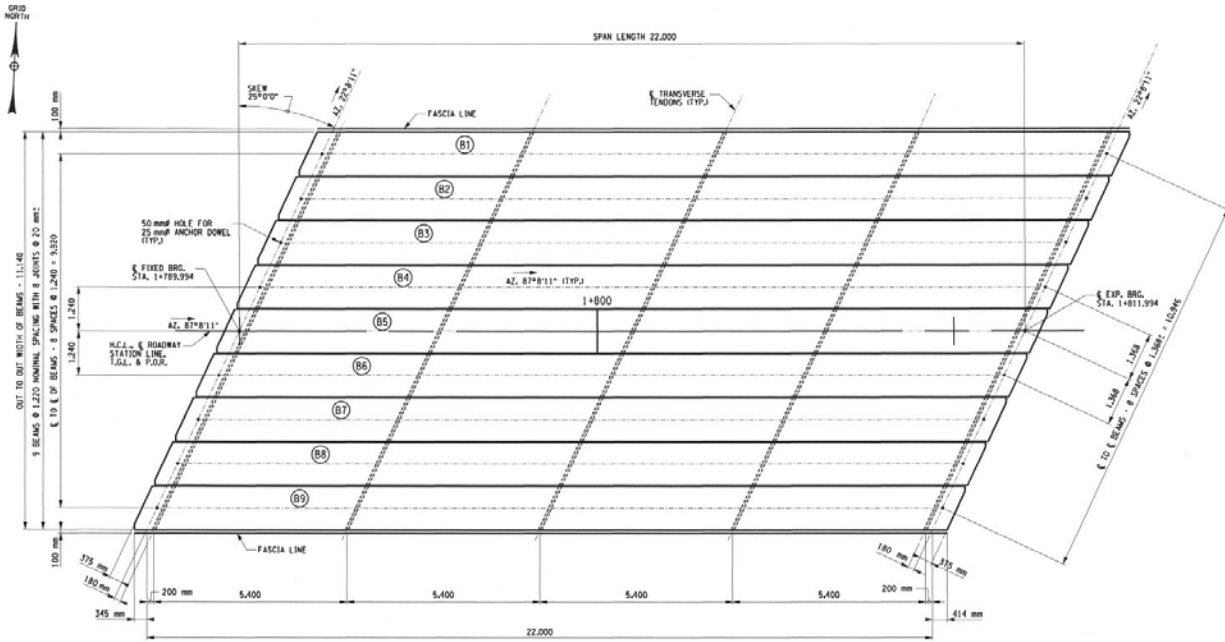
Plan View of Glenridge Road over Alplaus Kill
